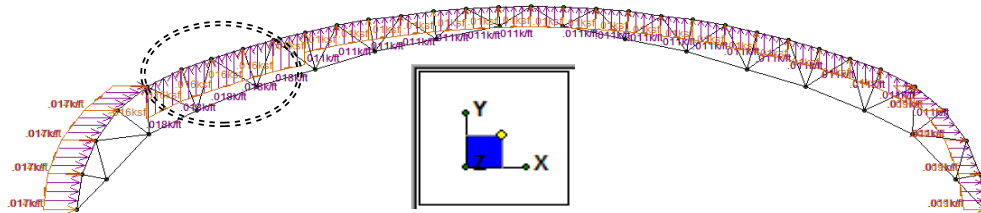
Wind Load Case 2 with Overhang Loading on Hangar Q - Elevation
